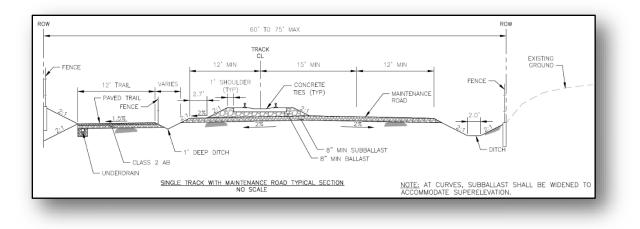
Conceptual Typical Section for Unconstrained Corridor Widths with a Maintenance Access Road Adjacent to Tracks
